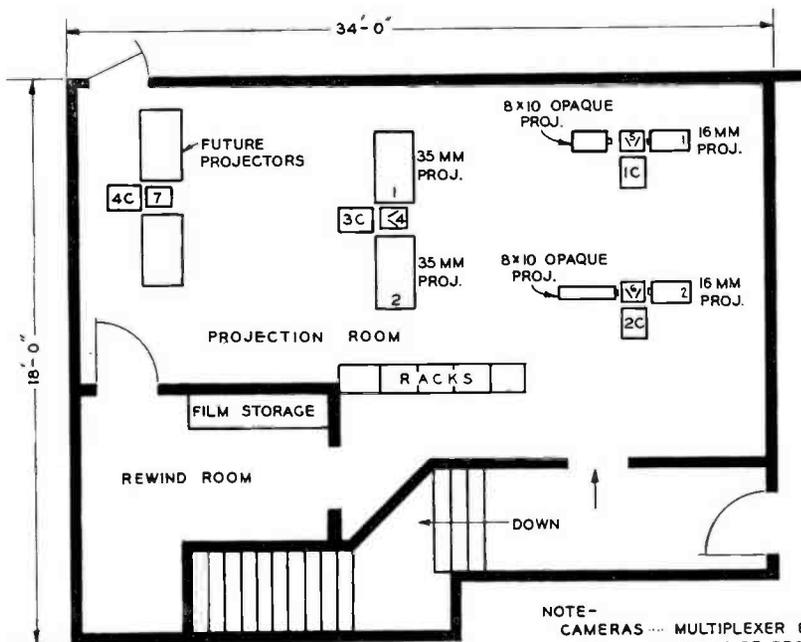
Floor plan layout of WOR-TV Projection Room facilities located on the second floor.
